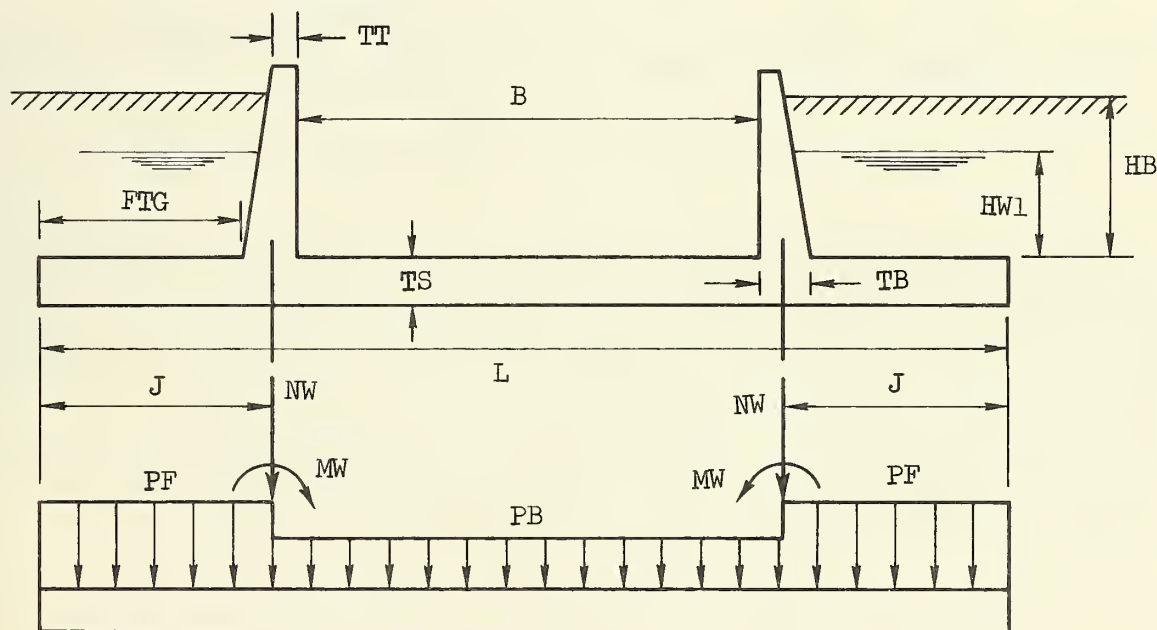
Floor slab analyses and loading for LC#1 when  $H_B > H_{W1}$ .
